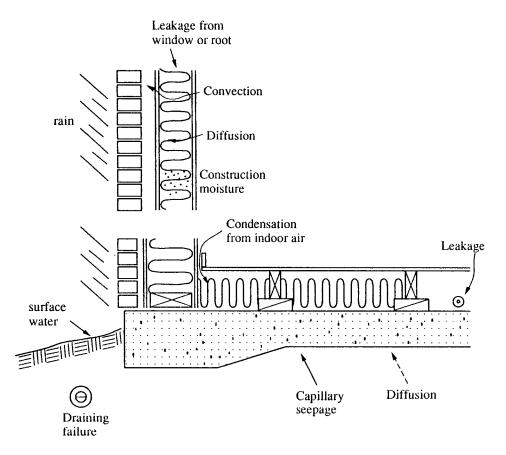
Mechanisms of moisture accumulation in the wall and concrete slab floor structures of a building.
